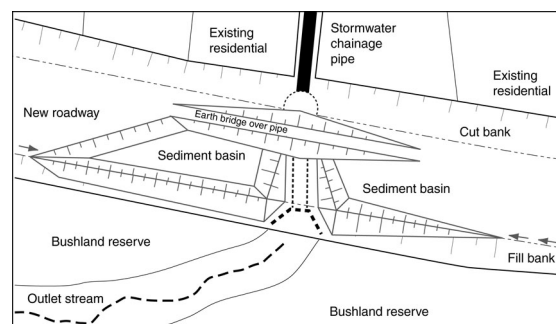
Stage 2: Earth bridge built over pipe to allow construction access and *Sediment Basins* formed within the road reserve to minimise damage to the adjacent stream and bushland reserve
